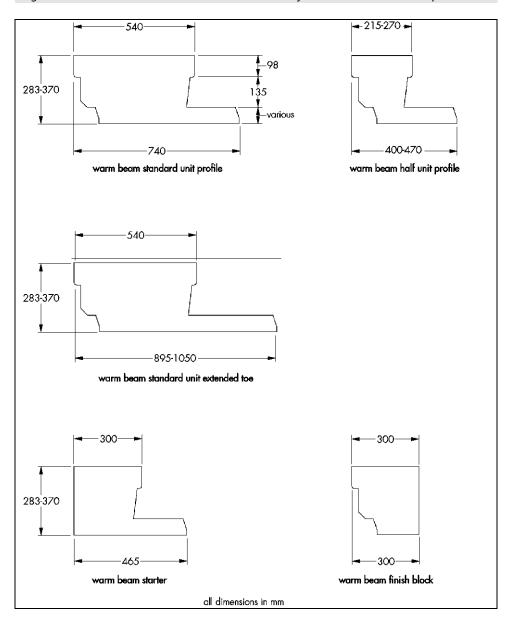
Warm Beam and Warm Beam Plus blocks for use with 225 mm deep beams
